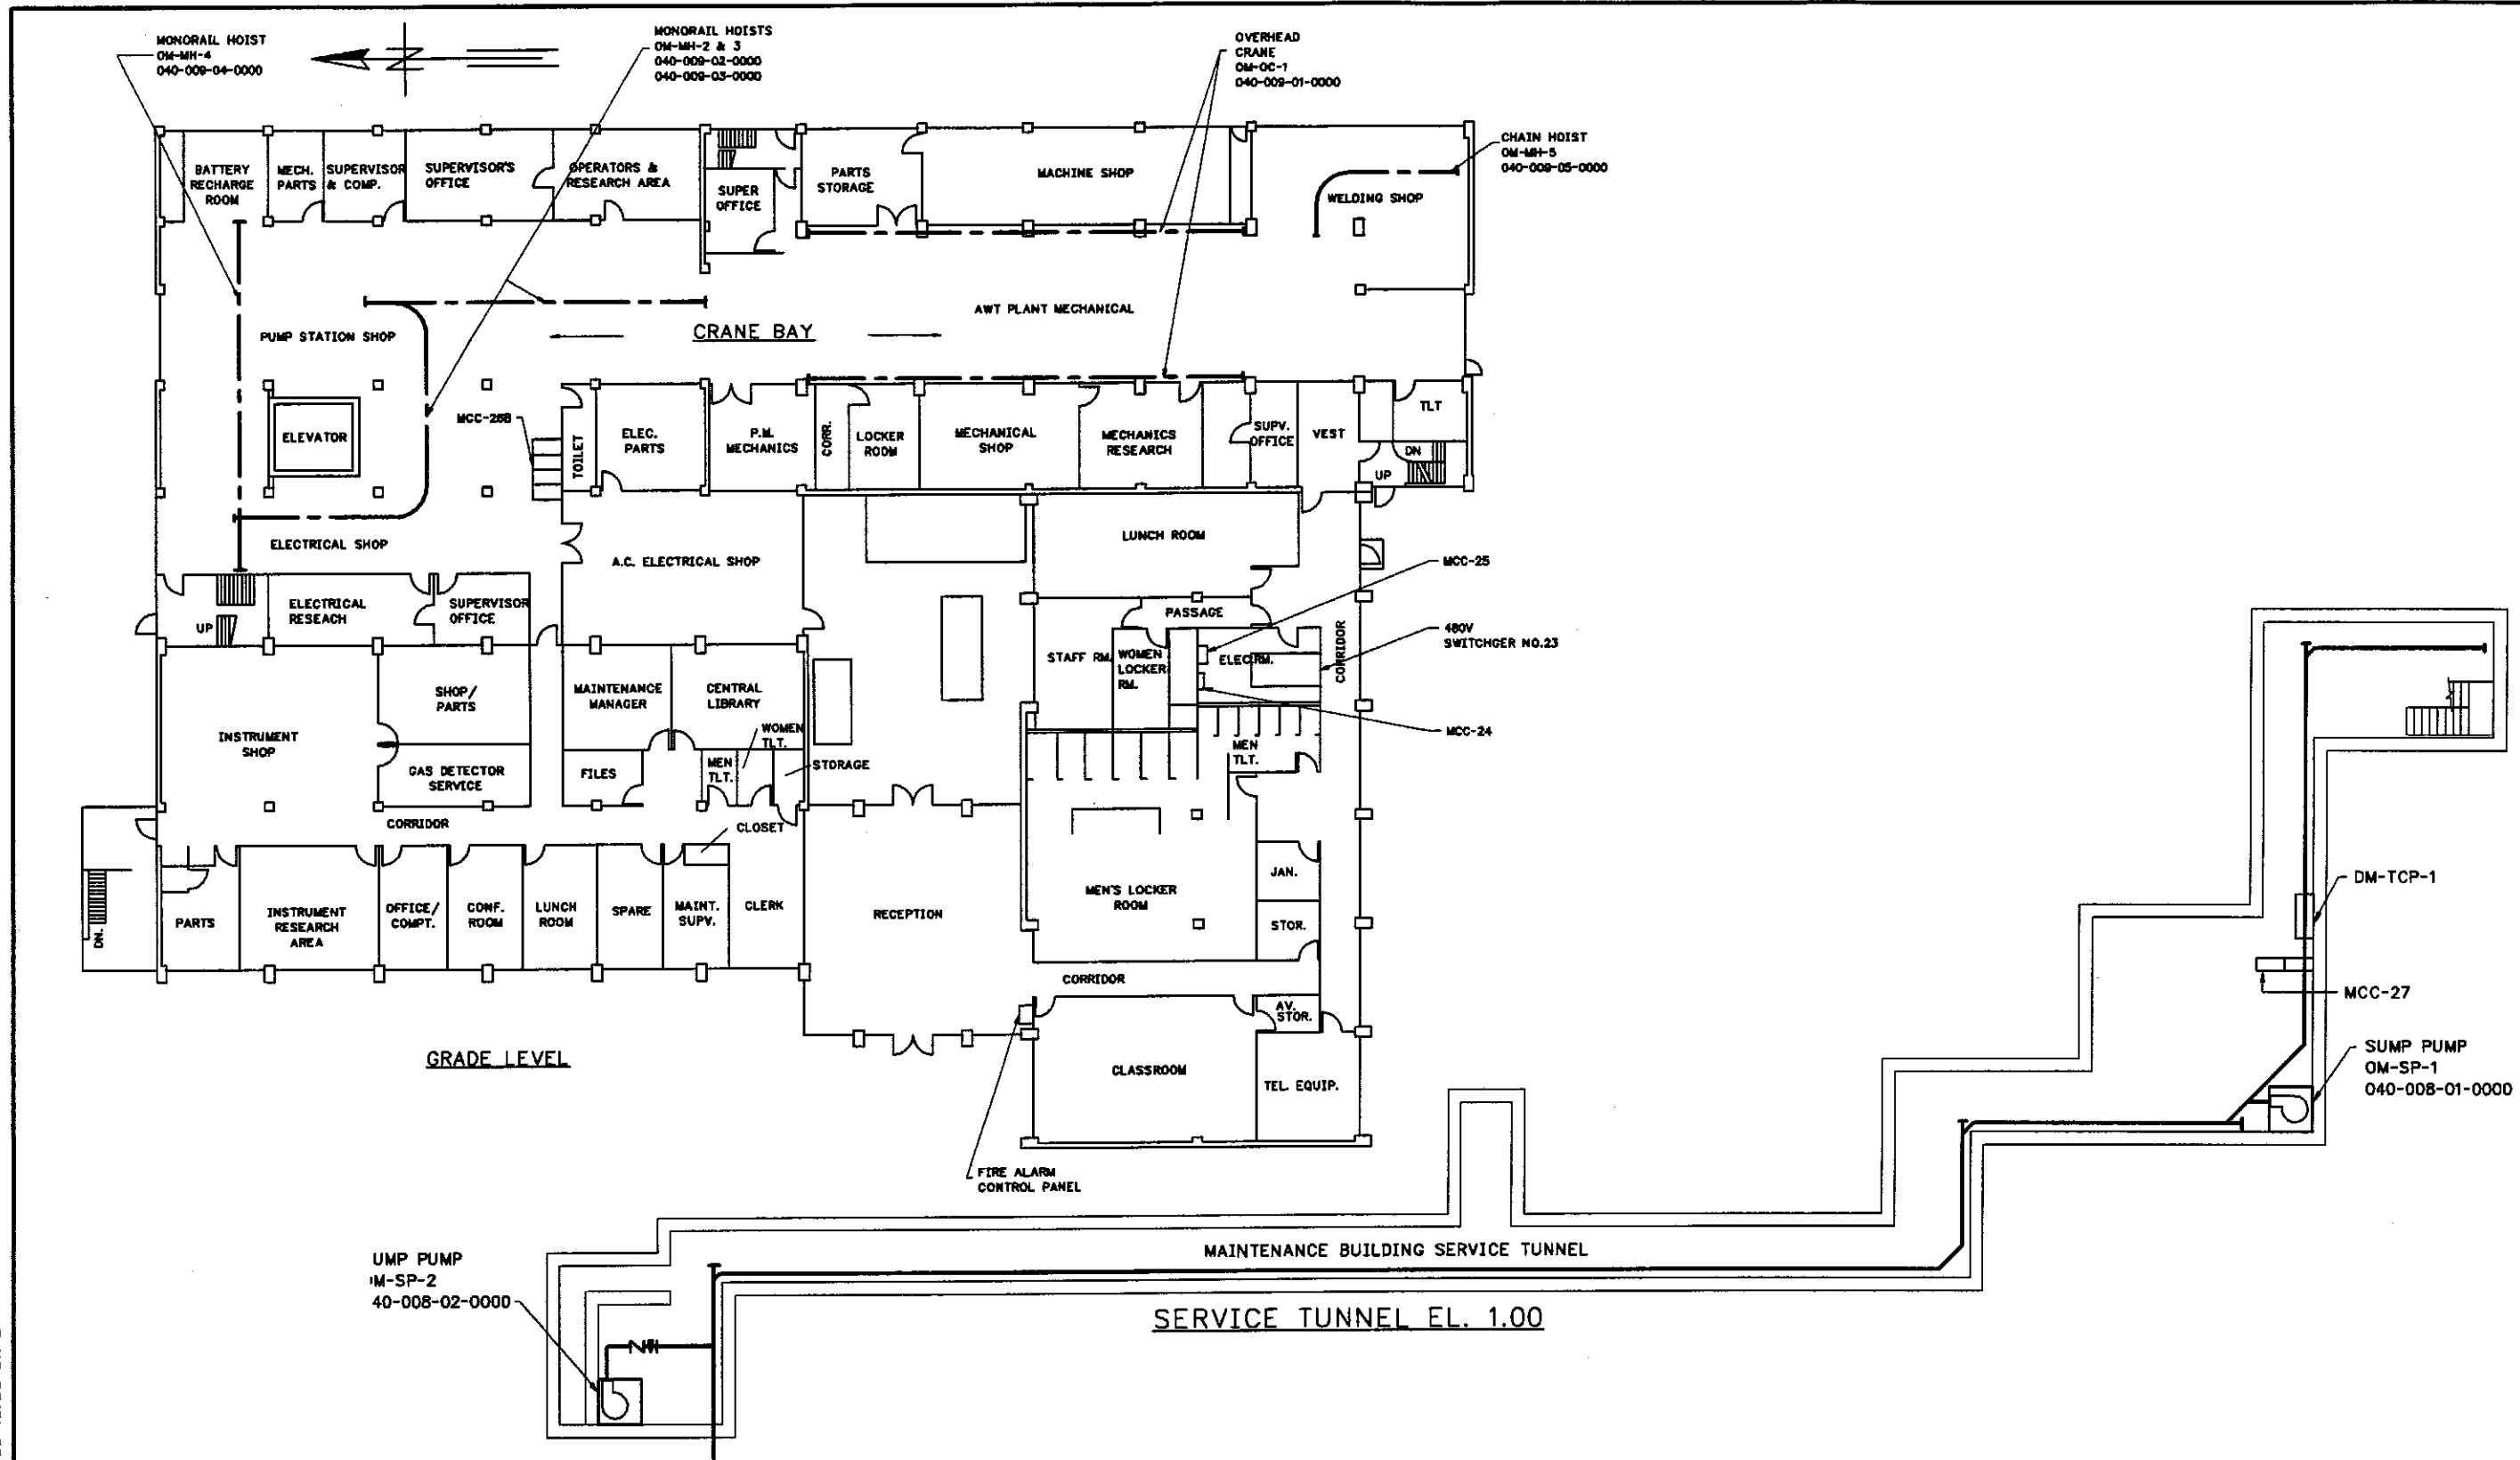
FIGURE III-AD-OMB-1 MAINTENANCE BUILDING PLAN
